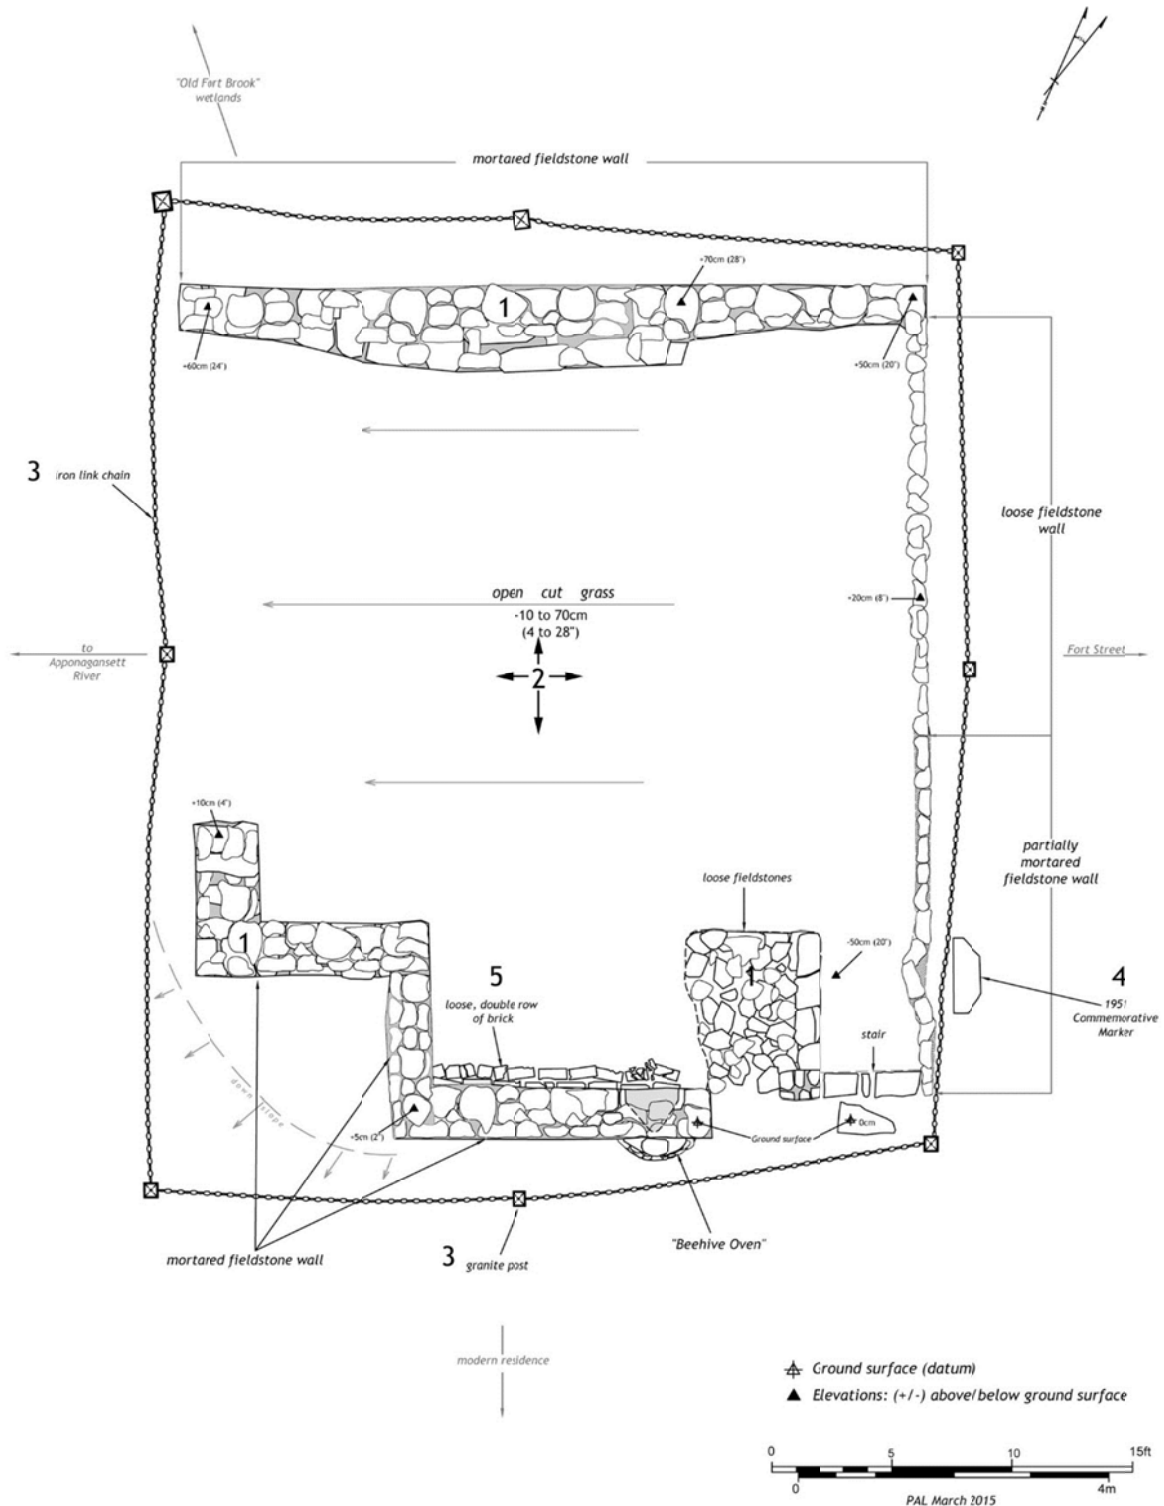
Site Plan key to Russell Garrison Data Sheet.
